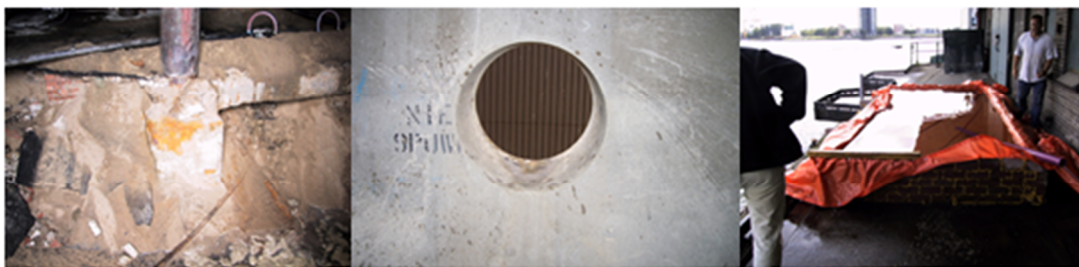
Jobsveem - Quality testing (Left) Digging and visual inspections (Mid) Concrete cylindrical specimens (Right) Load test loading platforms
